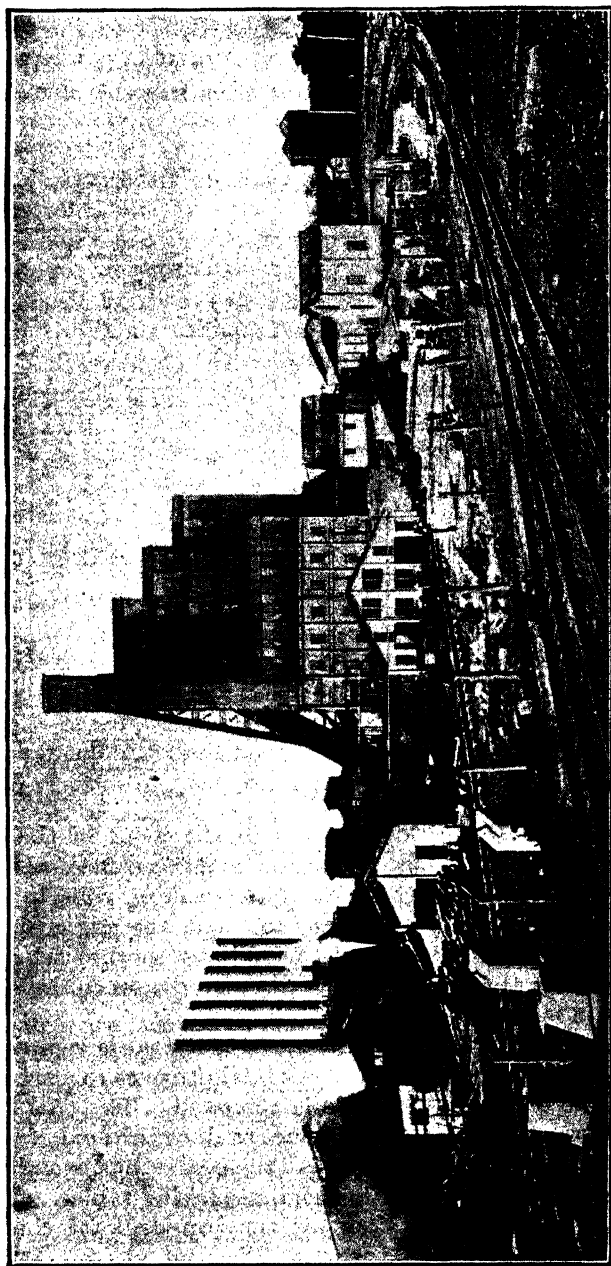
VIEW OF BUCK MOUNTAIN COLLIERY OF LEHIGH VALLEY COAL CO., ALSO SHOWING BREAKER.
